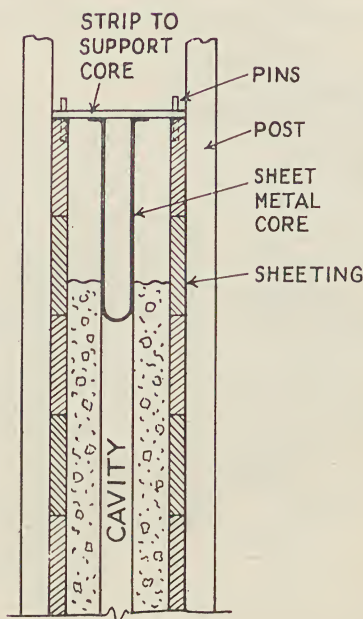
METHOD OF FORMING CAVITY IN IN-SITU CONCRETE WALL.
